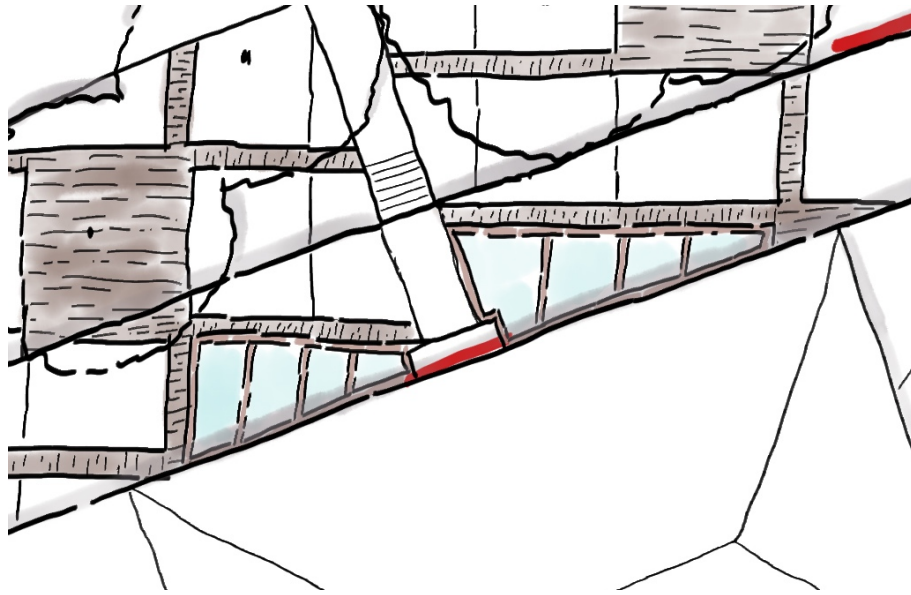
All-year outdoor work spaces - the greenhouses on the roof of the project site building.
